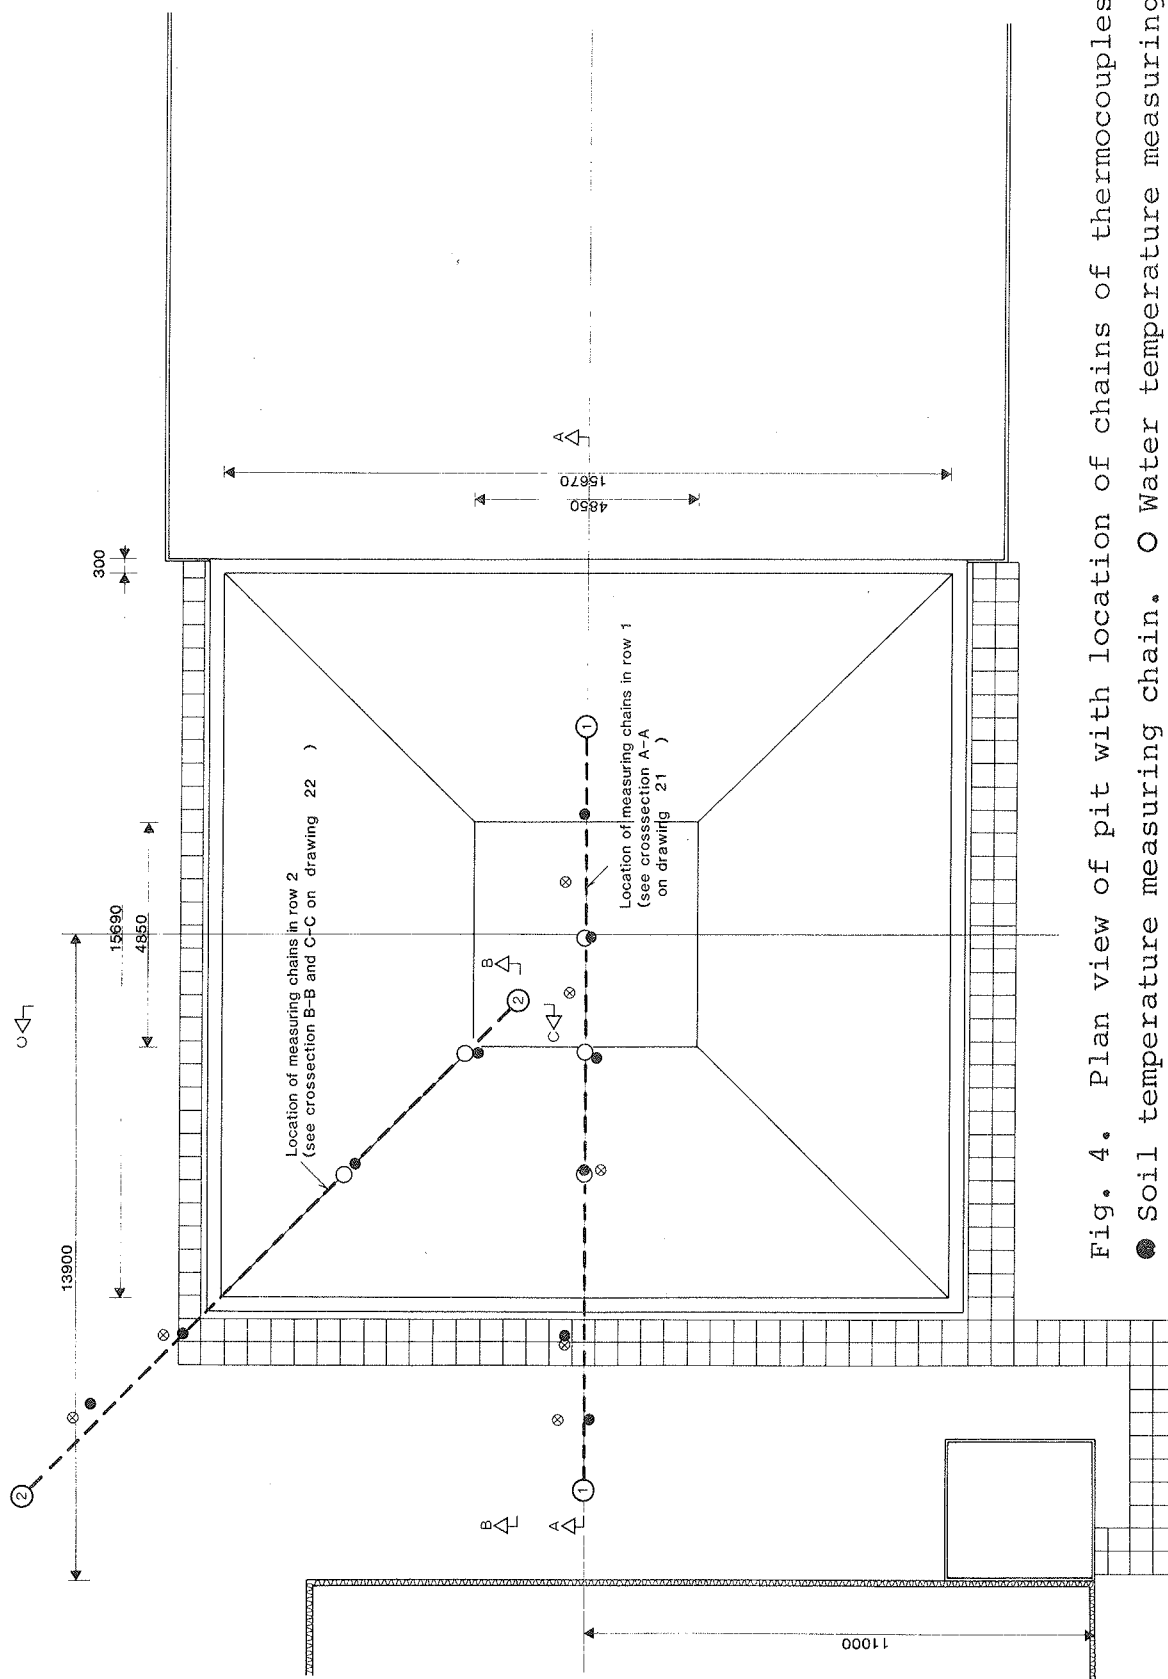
Plan view of pit with location of chains of thermocouples shown.
